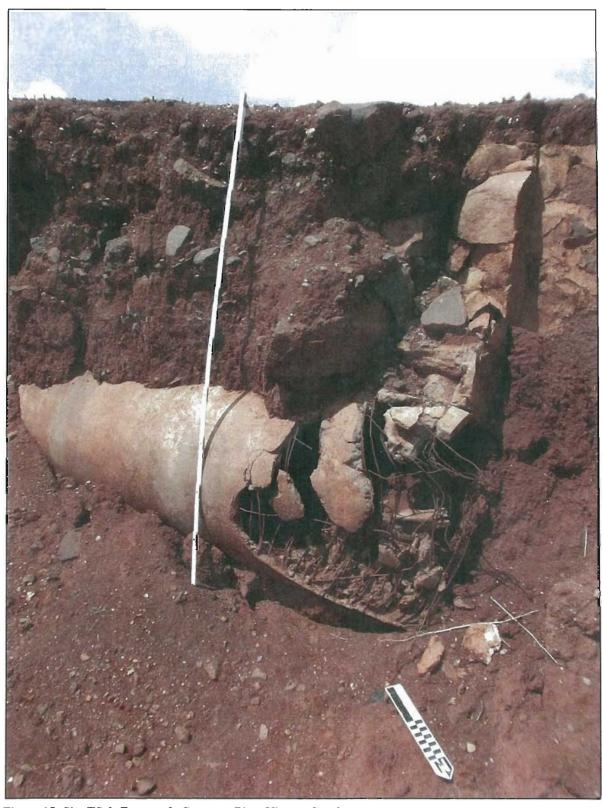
Site TS-2, Feature 2, Concrete Pipe. View to Southwest.
